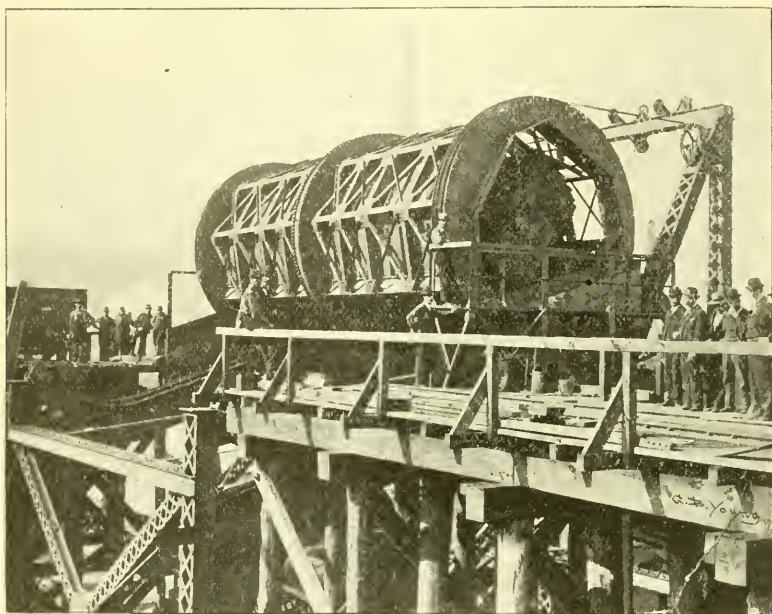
CAR DUMPER BUILT BY THE EXCELSIOR IRON WORKS CO. ERIE COAL TRANSFER CO., CLEVELAND, OHIO.
